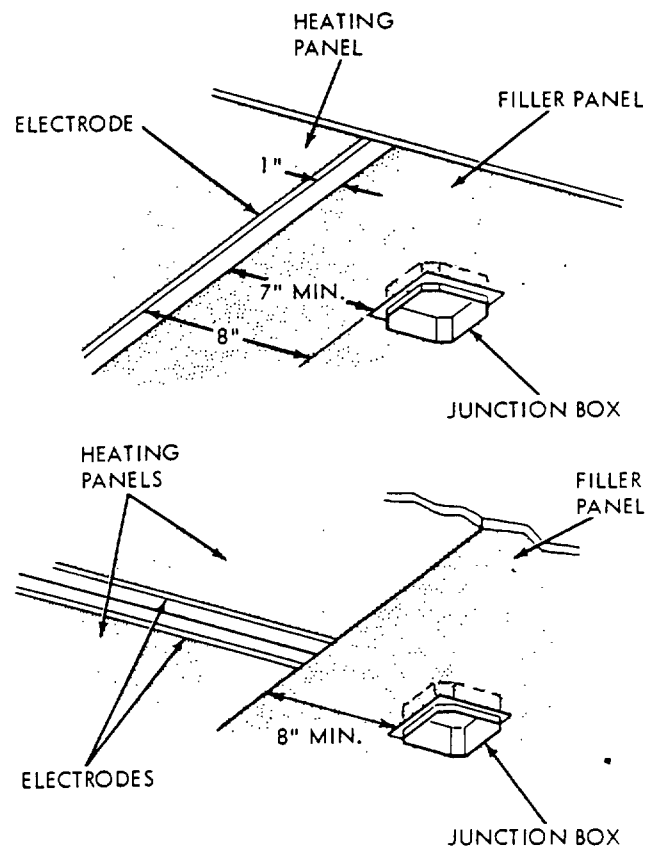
Light Fixture Junction Boxes Adjacent to Heating Panels
